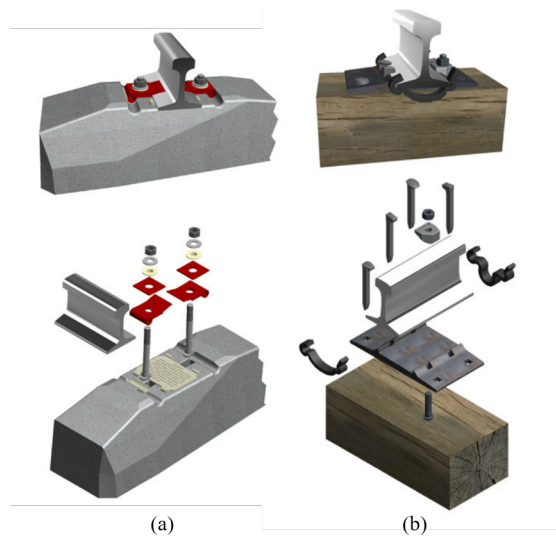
(a) Fastener for concrete sleepers. (b) Fastener for wood sleeper. [19]
